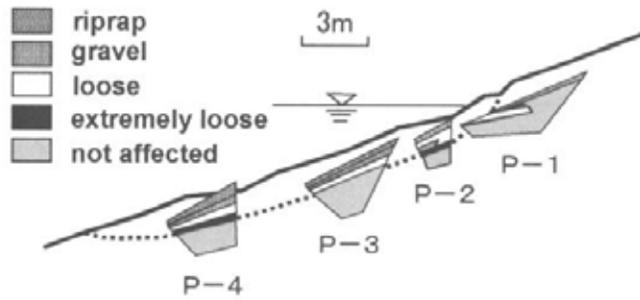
Cross section of the sliding failure by pit excavation investigation
